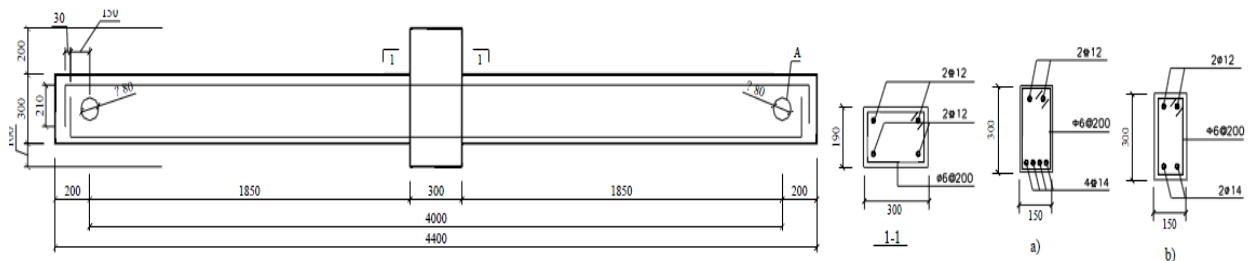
Specimens Detail (Wei-jian and Qing-feng 2008)
